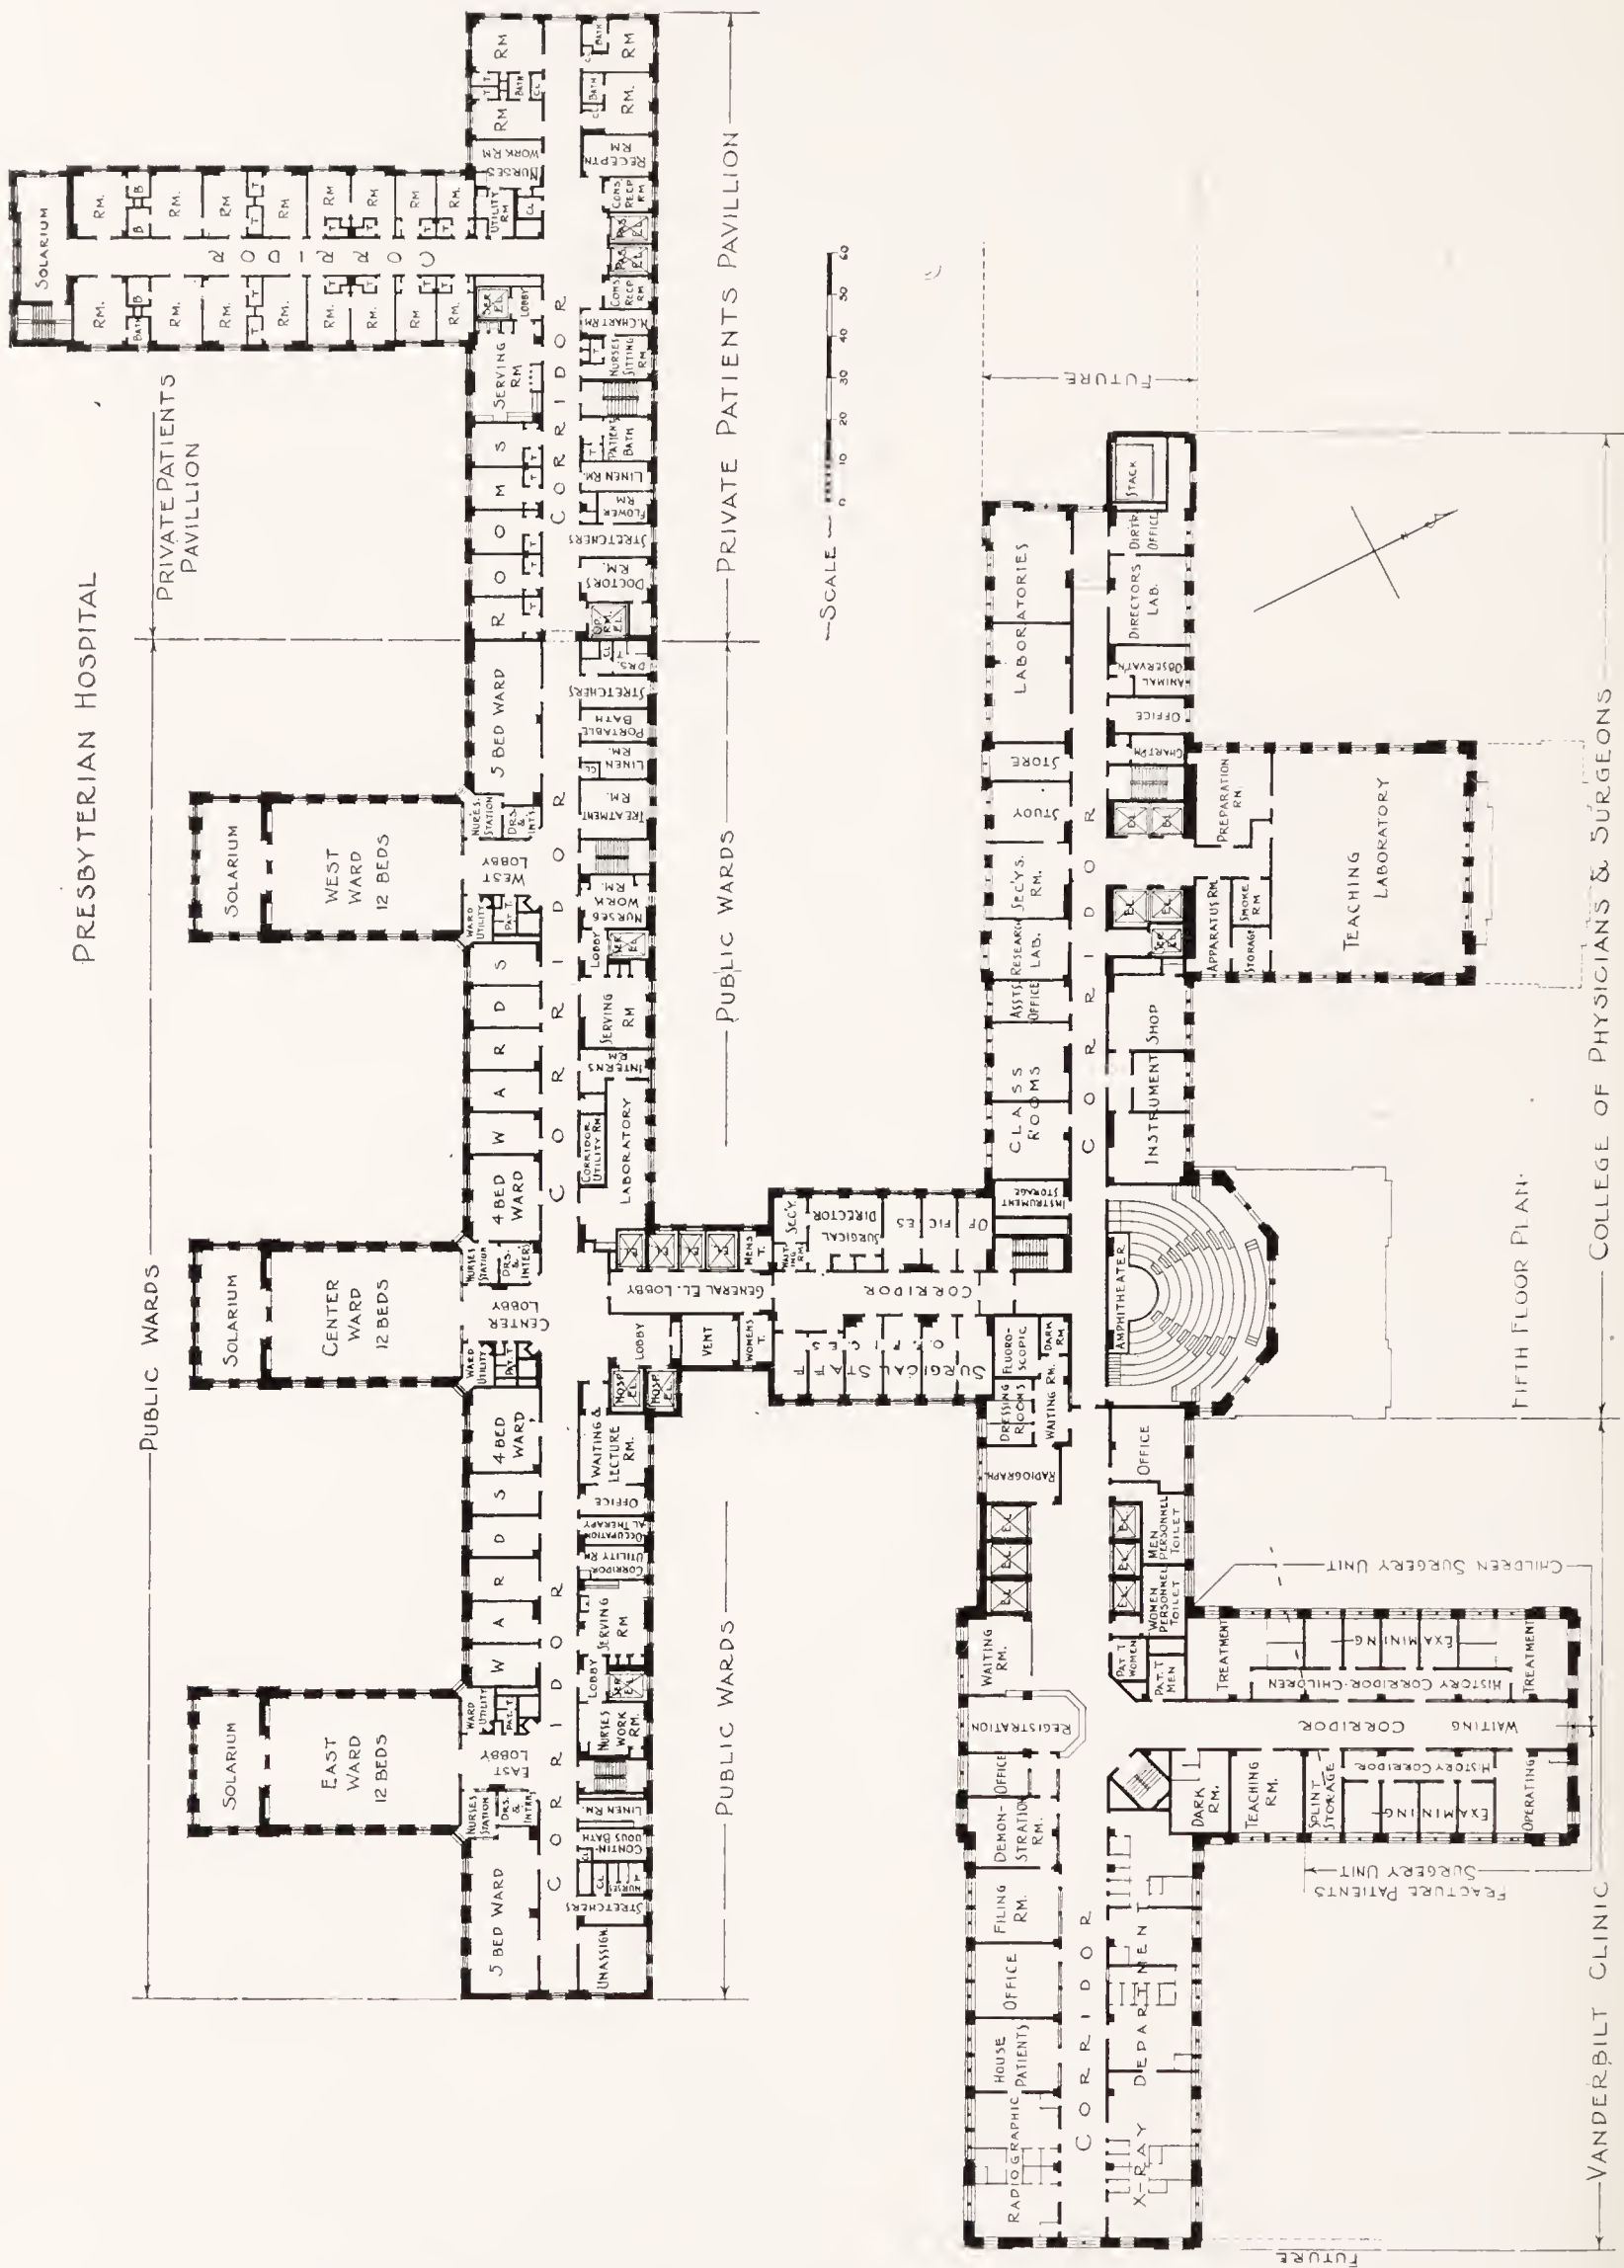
TYPICAL PLAN, COLUMBIA-PRESBYTERIAN HOSPITAL, NEW YORK, N. Y.
